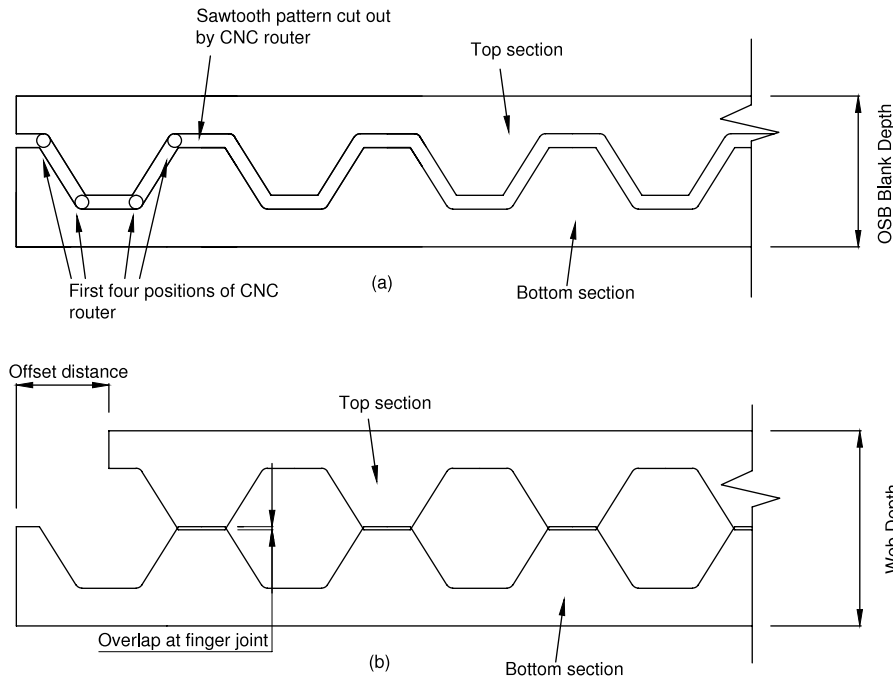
Manufacture of castellated web: (a) Original OSB blank panel with sawtooth pattern; (b) Castellated OSB web.
